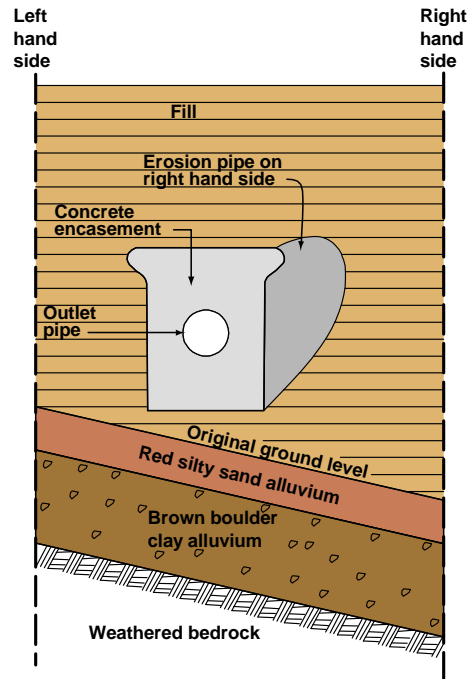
Cross section through the outlet conduit showing pipe, encasement and erosion tunnel.
